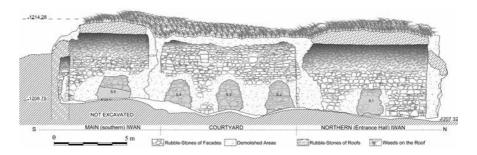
North-South Section (A-A) Facing Westwards of Al Hüsâmîye Madrasa
